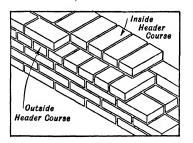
Method of lapping inside and outside header courses in 12" solid brick walls, common bond.
